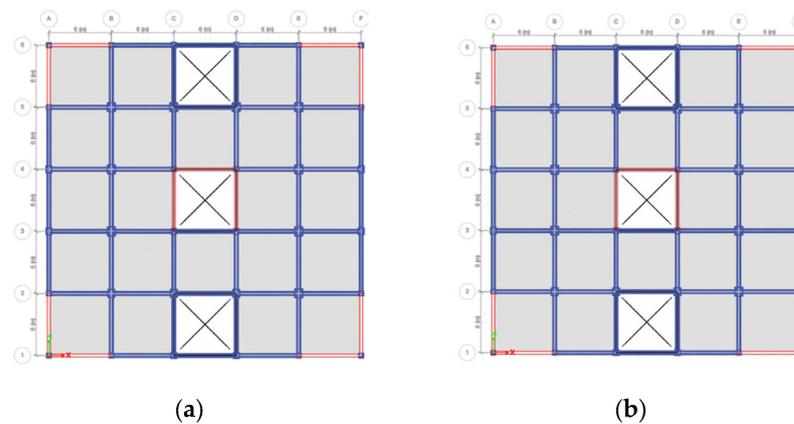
(a) G + 15 shear wall with opening Floor Plan; (b) G + 15 shear wall without opening Floor Plan.
